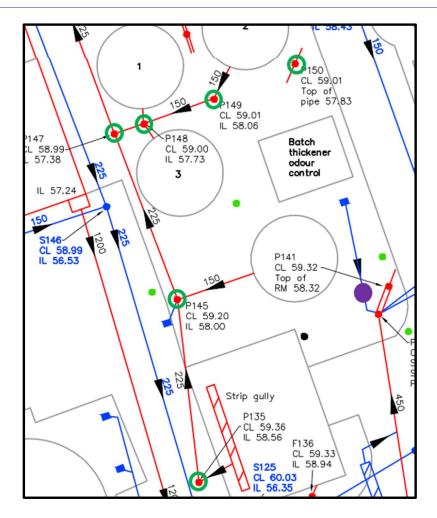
Site drainage outfall pipes and manholes into head of the works that require isolation.
